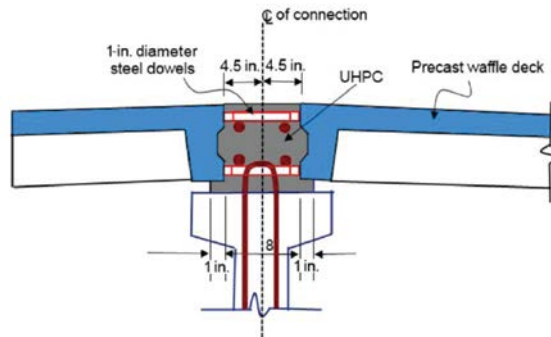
Panel-to-panel and panel-to-girder connection [28]
